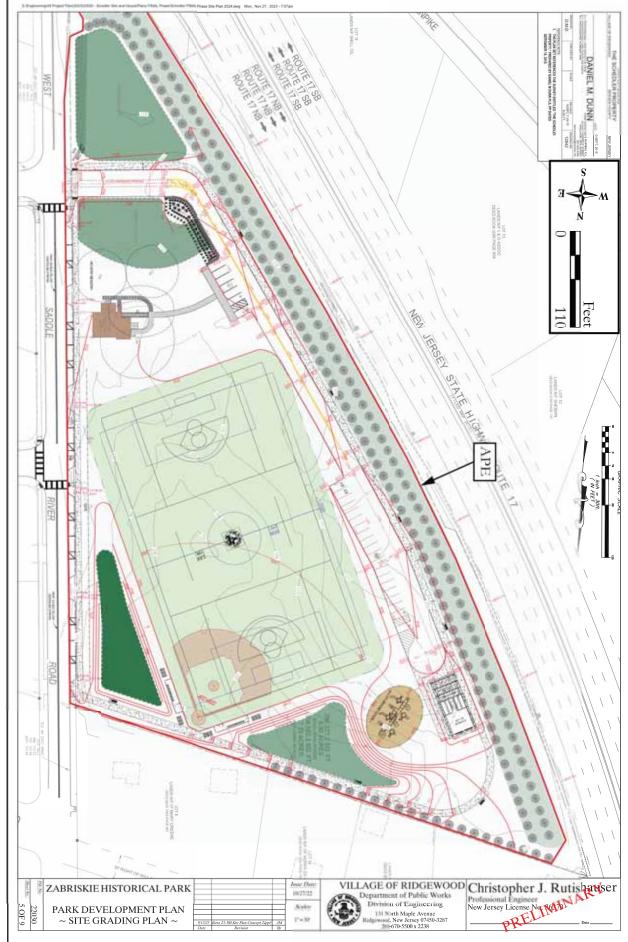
Zabriskie-Schedler Property Park Development Plan (Village of Ridgewood, Department of Public Works 2023a).
